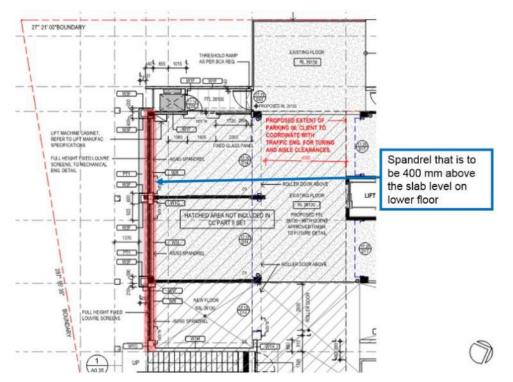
Location of the proposed spandrel that is 400 mm above the slab level on the ground level (ground level shown)
